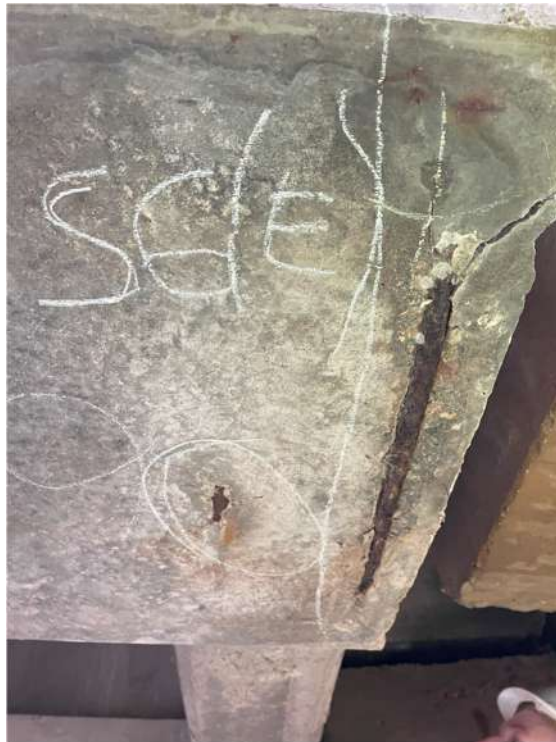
Beam 5 (south facing), half joint east, spalling with cracking present
